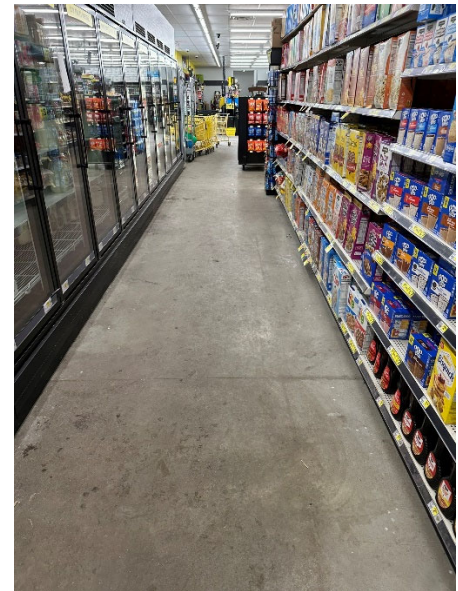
Interior, looking down aisle, notice intact concrete floor.
